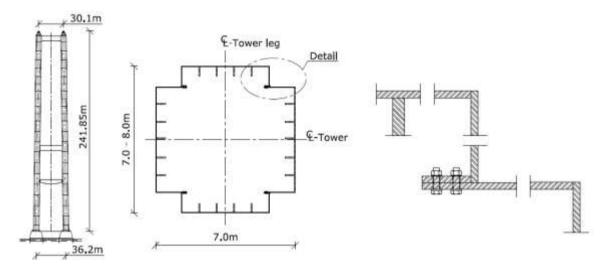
Tower elevation (left), tower leg cross-section (middle), detail (right)
